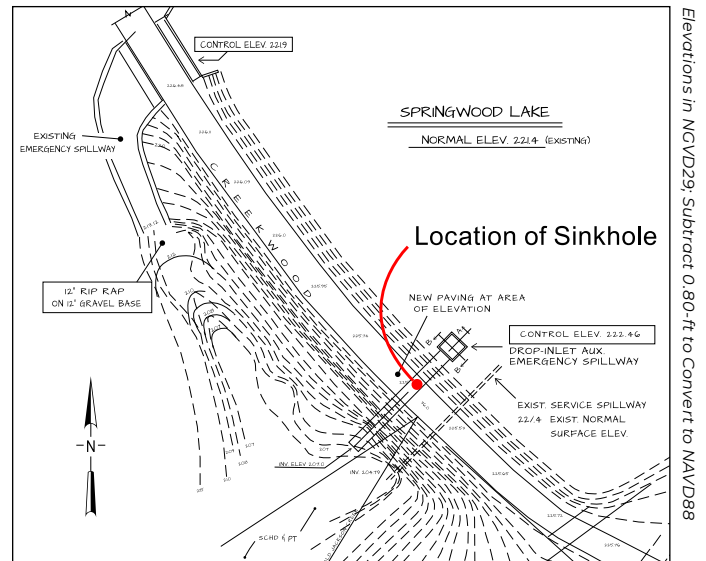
Plan View from 1984 Modification to Add 14x14 Concrete Drop Inlet as Second Auxiliary Spillway
